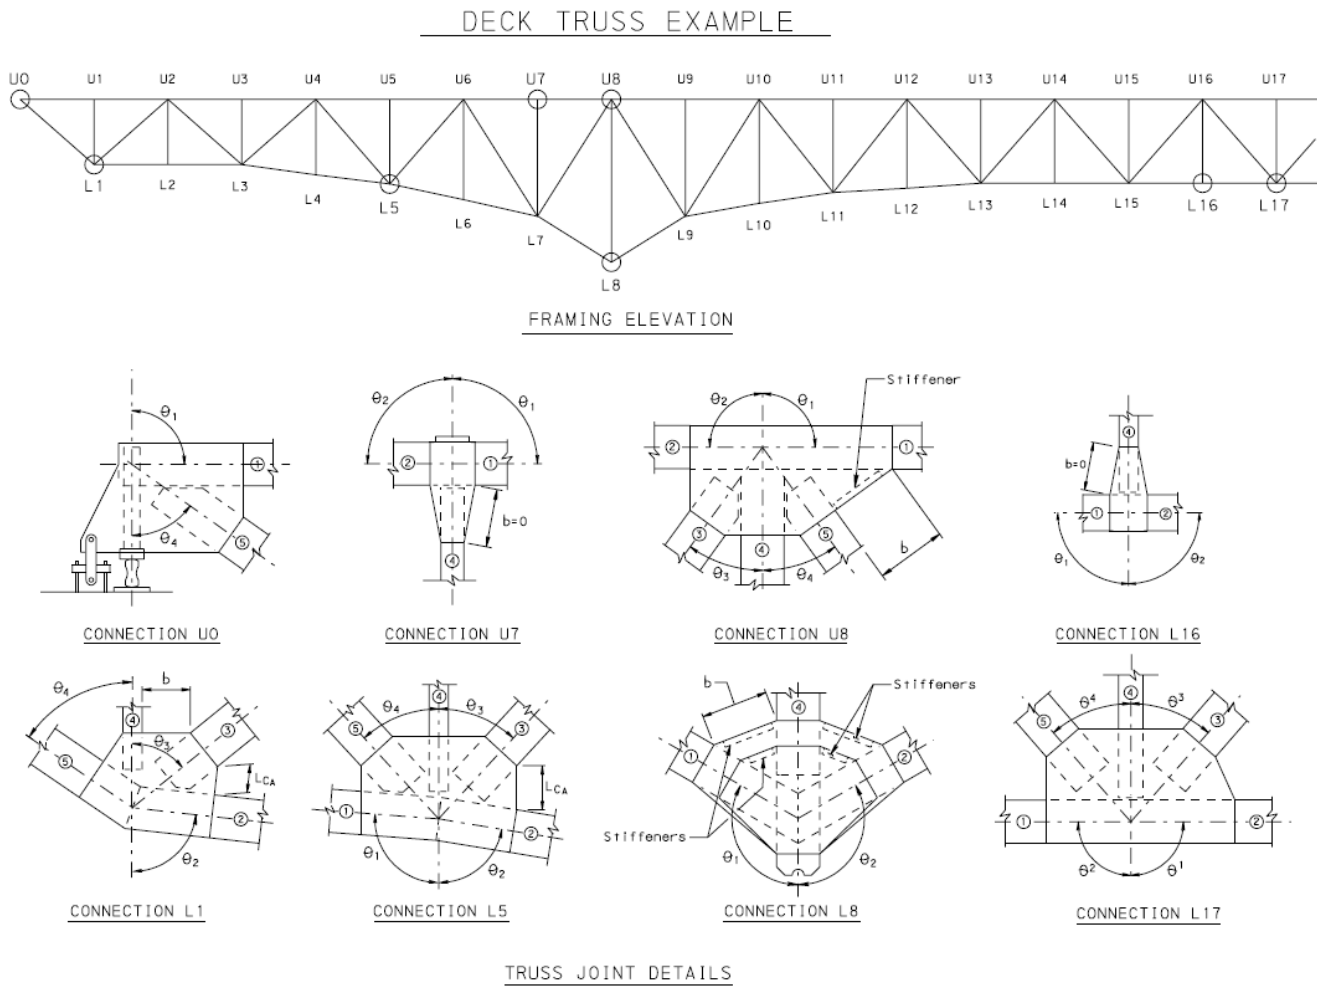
Gusset Plate Geometry: Deck Truss Example
